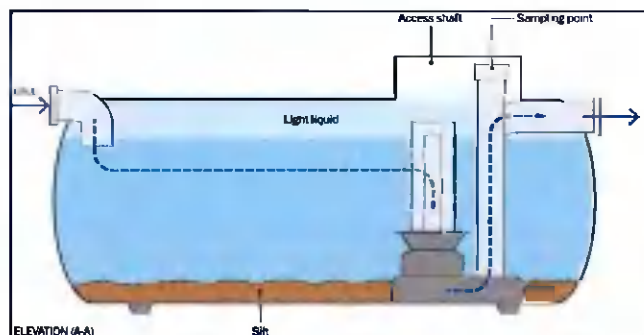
Typical Section Detail of Fuel Separator (CIRIA C753)
